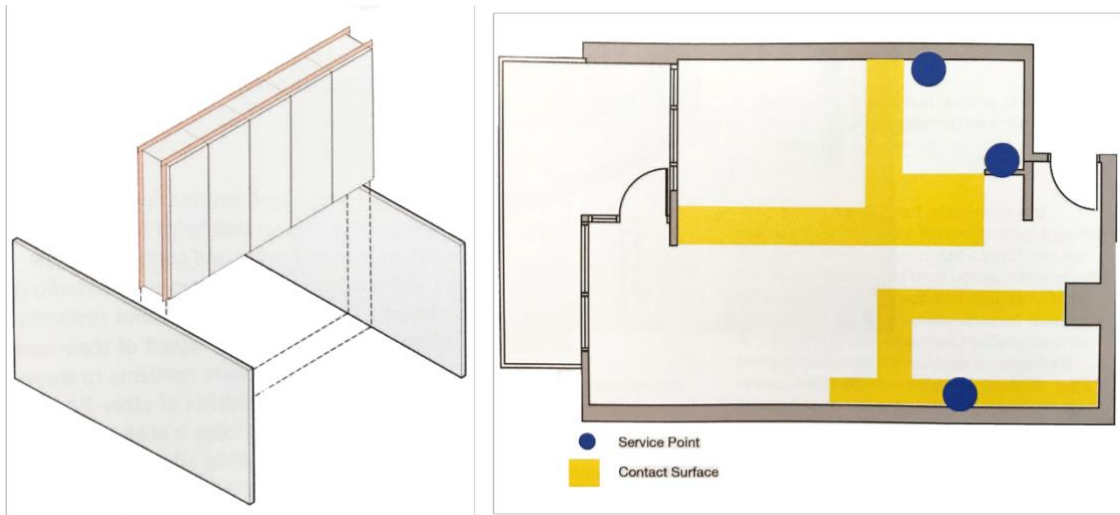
(Left) Concept of the infill system (Right) Plan of a possible apartment layout showing the placement of the infill cabinetry and the service points (Brown, 2016)
